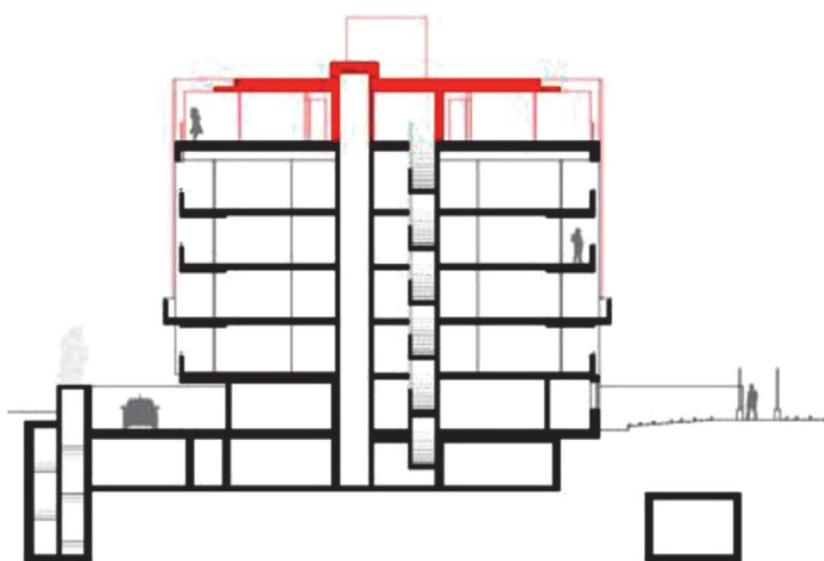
Vertical intersection of the building (floor added during retrofitting, red), Photo credit: Kämpfen für Architektur [24]
